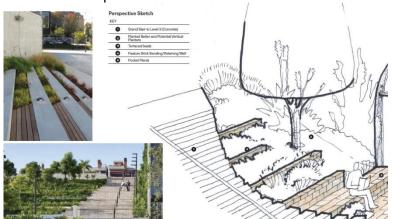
Excerpt from the landscape package depicting proposed landscape seating treatment to stairs from Mills Boulevard
